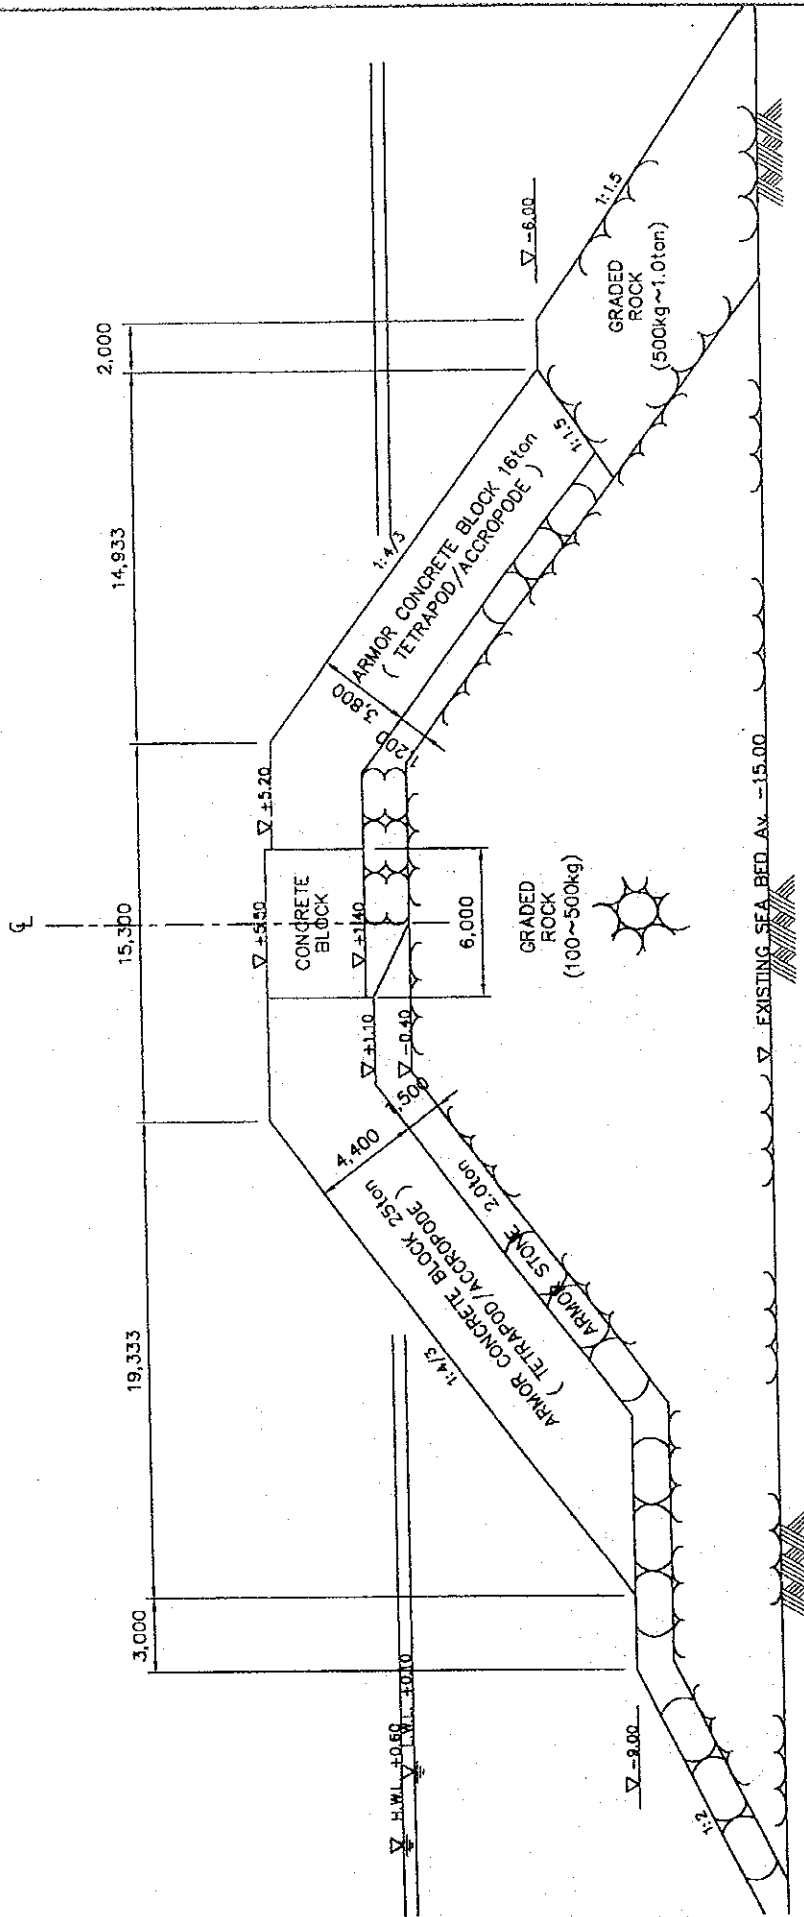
Typical Cross Section of Outer Breakwater
